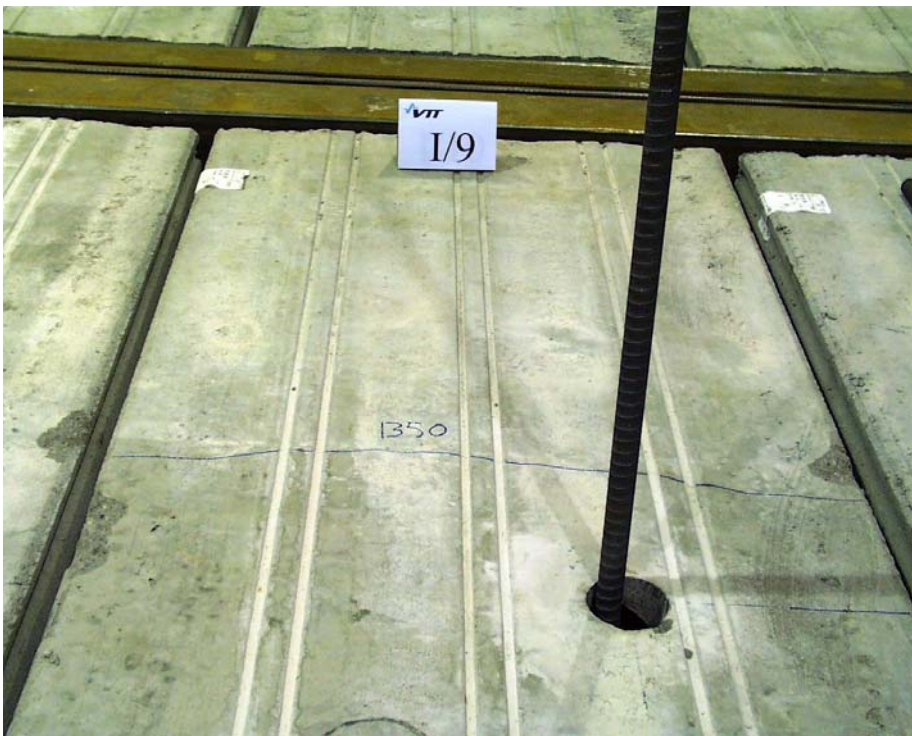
Initial bending crack in slab 9 at a distance of 1350 mm from slab end.
